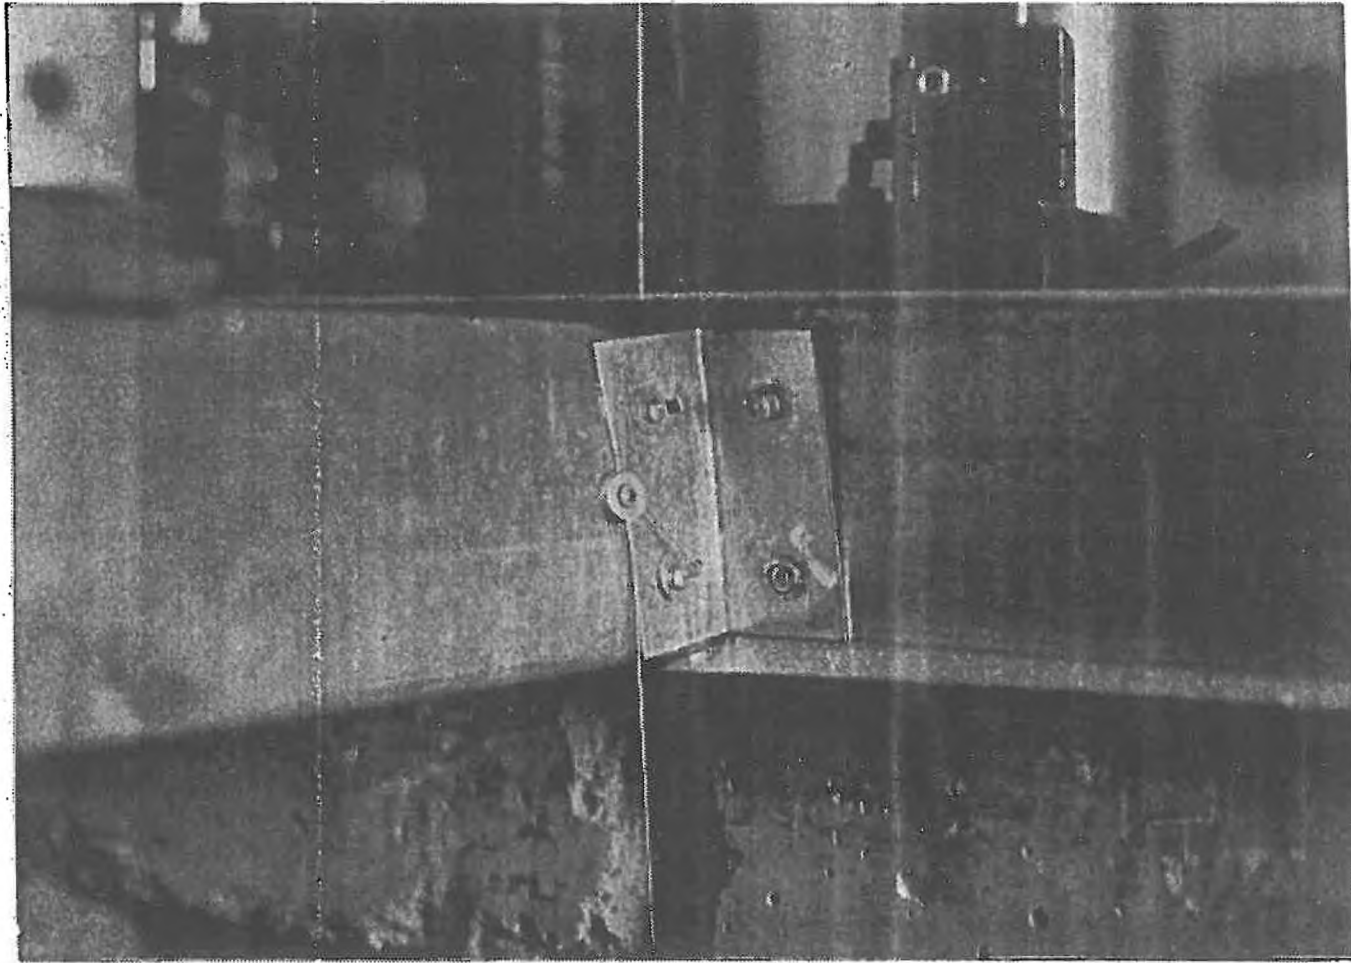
Photograph of Typical Failure of Clip Angle Connection
